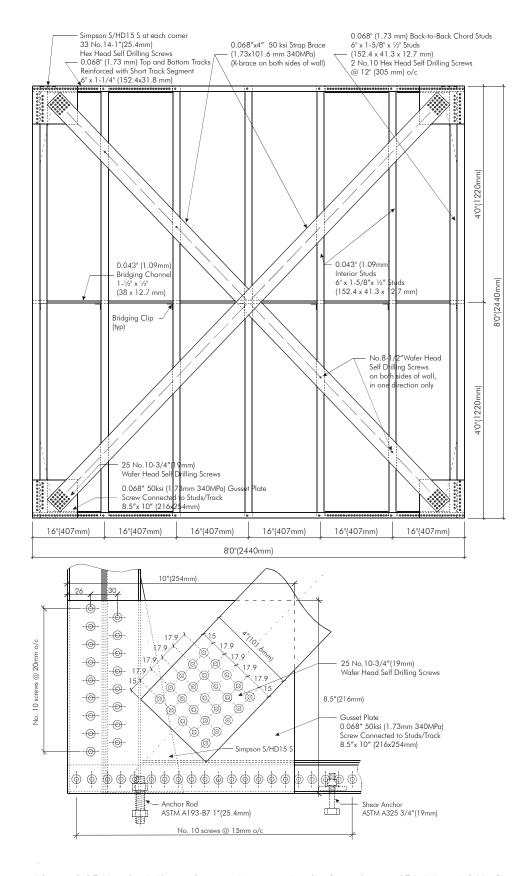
Nominal dimensions and corner detail of specimens 45A-M and 46A-C
